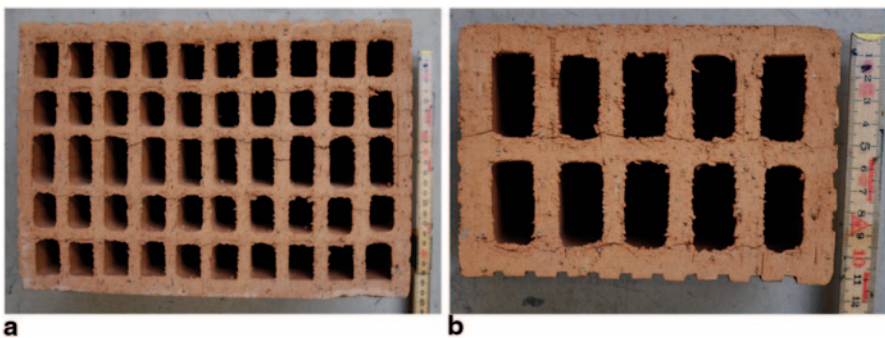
a Prototype of clay brick, and b model brick for masonry at scale 1:2
